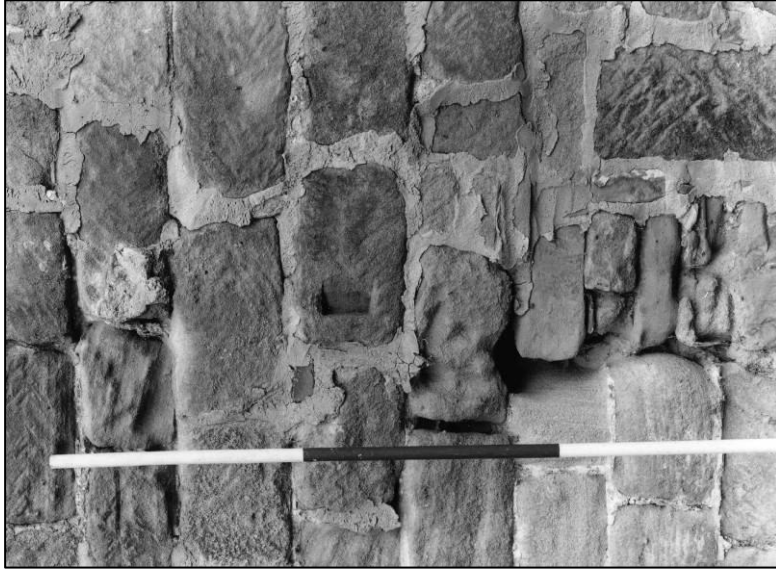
Socket at W end of S gable, looking NW (photo 2/13) (top to left).
